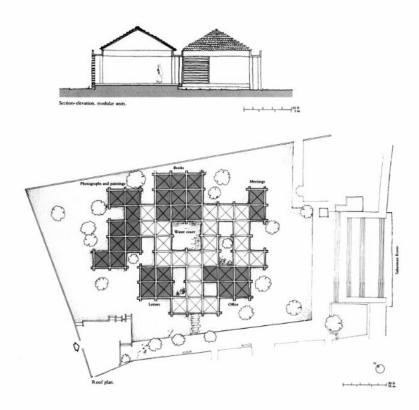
Sectional Elevation of the exhibition halls (top), Roof Plan (bottom)
